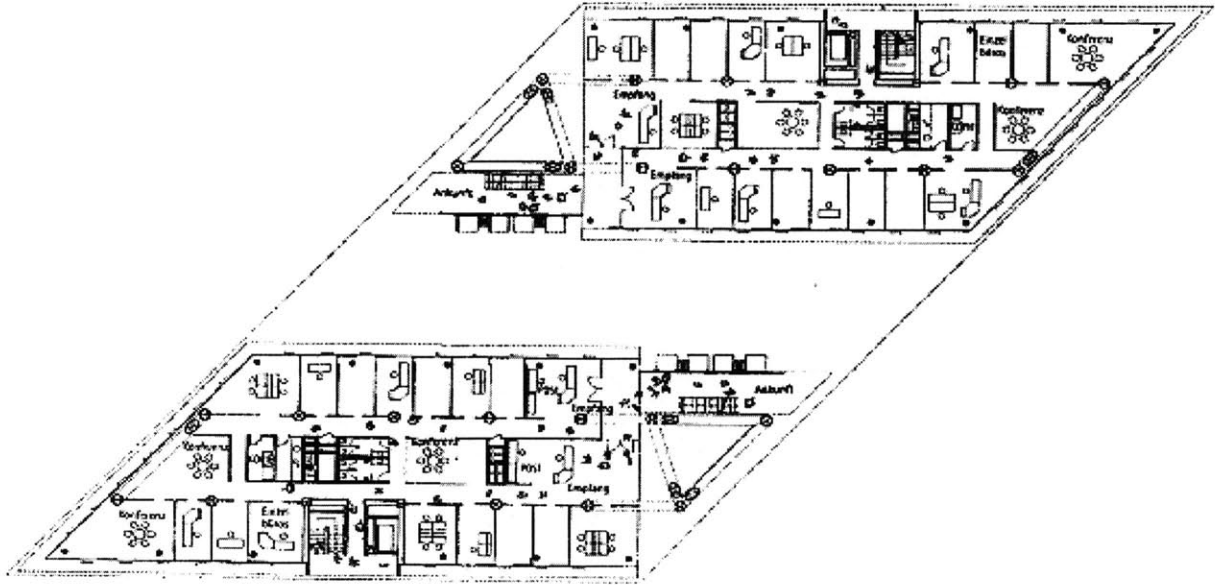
Typical floor layout for levels 1-13. The atrium in the center provides ventilation to those offices adjacent to it. All offices receive daylight and fresh air. (<http://www.stadtto.de>)
